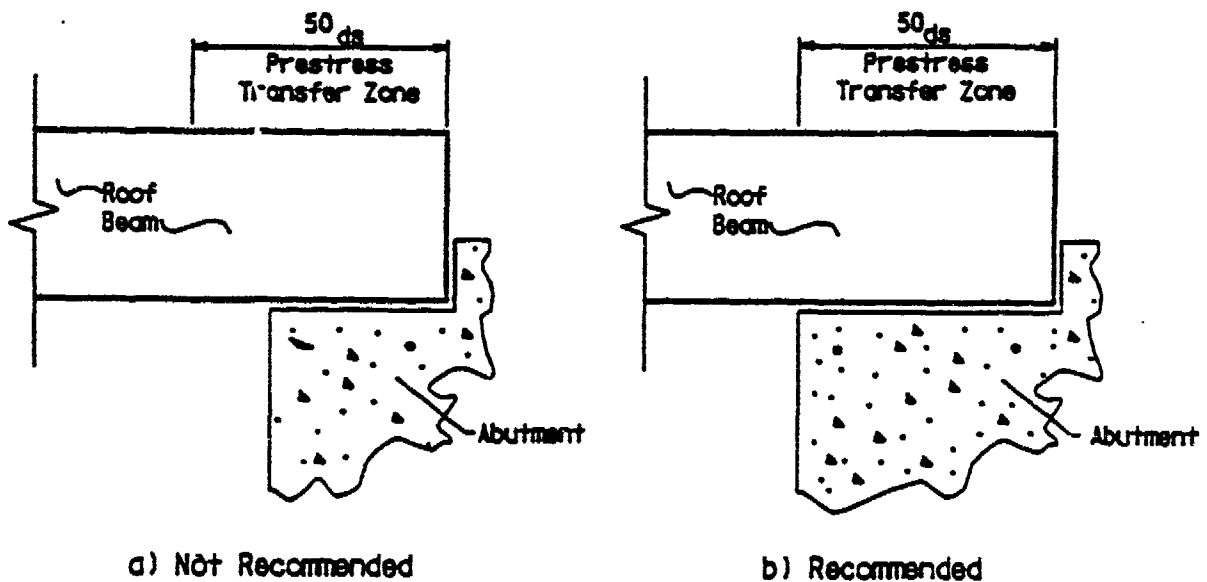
Abutment Requirement for Prestressed Roof Beam to Avoid Tensile Bond Failure.
